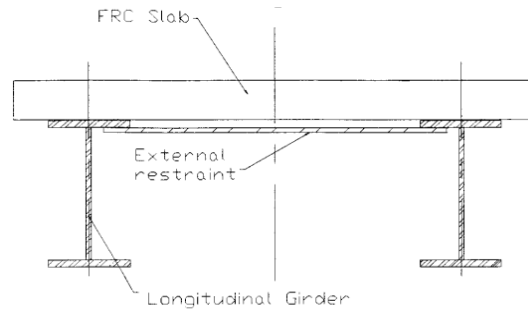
Section of externally reinforced slab-on-girder bridge with FRP deck slab
